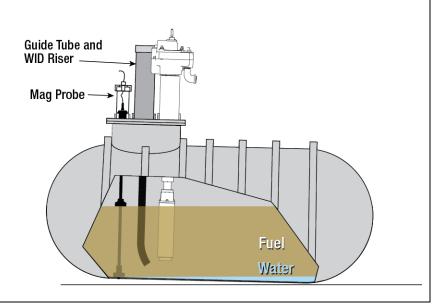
Guide Tube Installation Example - Tank tilting away from manway
